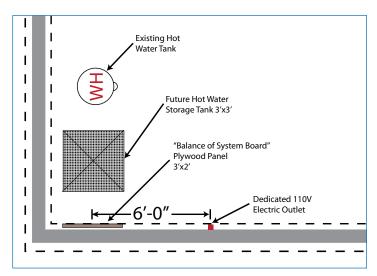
Utility Room Floor Plan. This plan should include the location of existing hot water heater, designated space for future hot water storage tank, electrical outlet, and pump package mounting panel.
